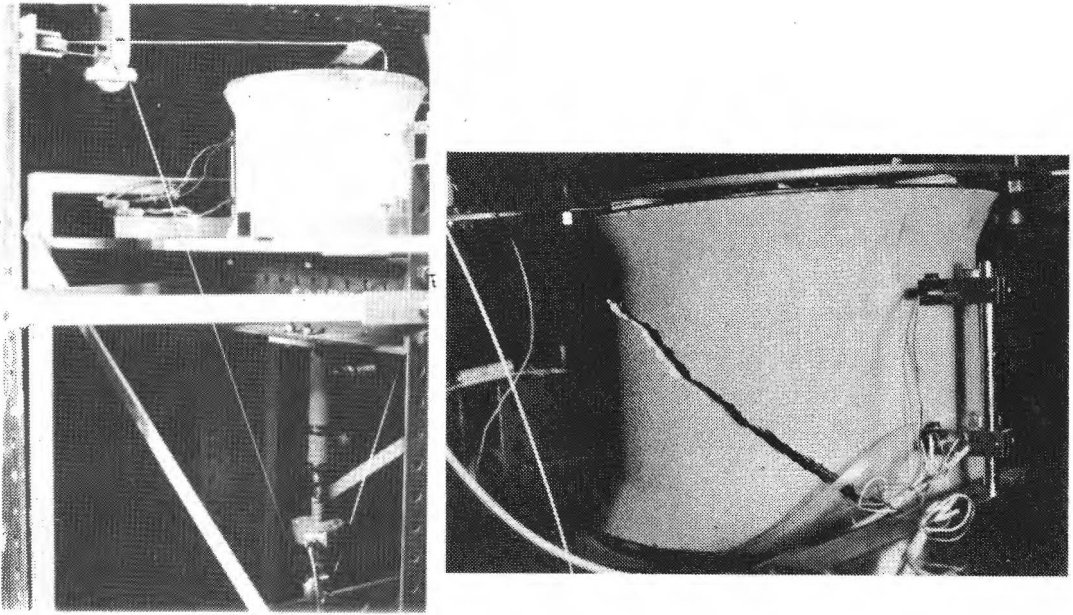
The torsion testing rig and the typical failure mode of a test specimen
